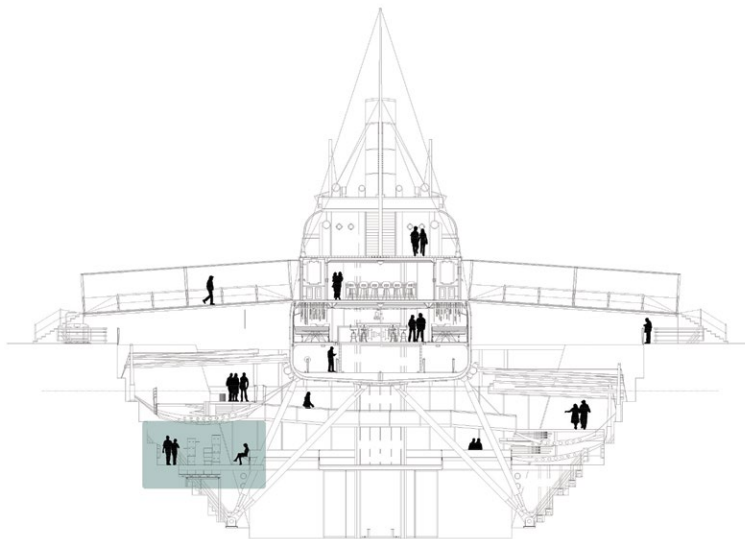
Final Proposed Stall Layout (Author, 2016)
